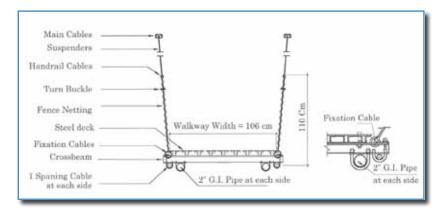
A Typical Plan of Suspension Type Bridge
